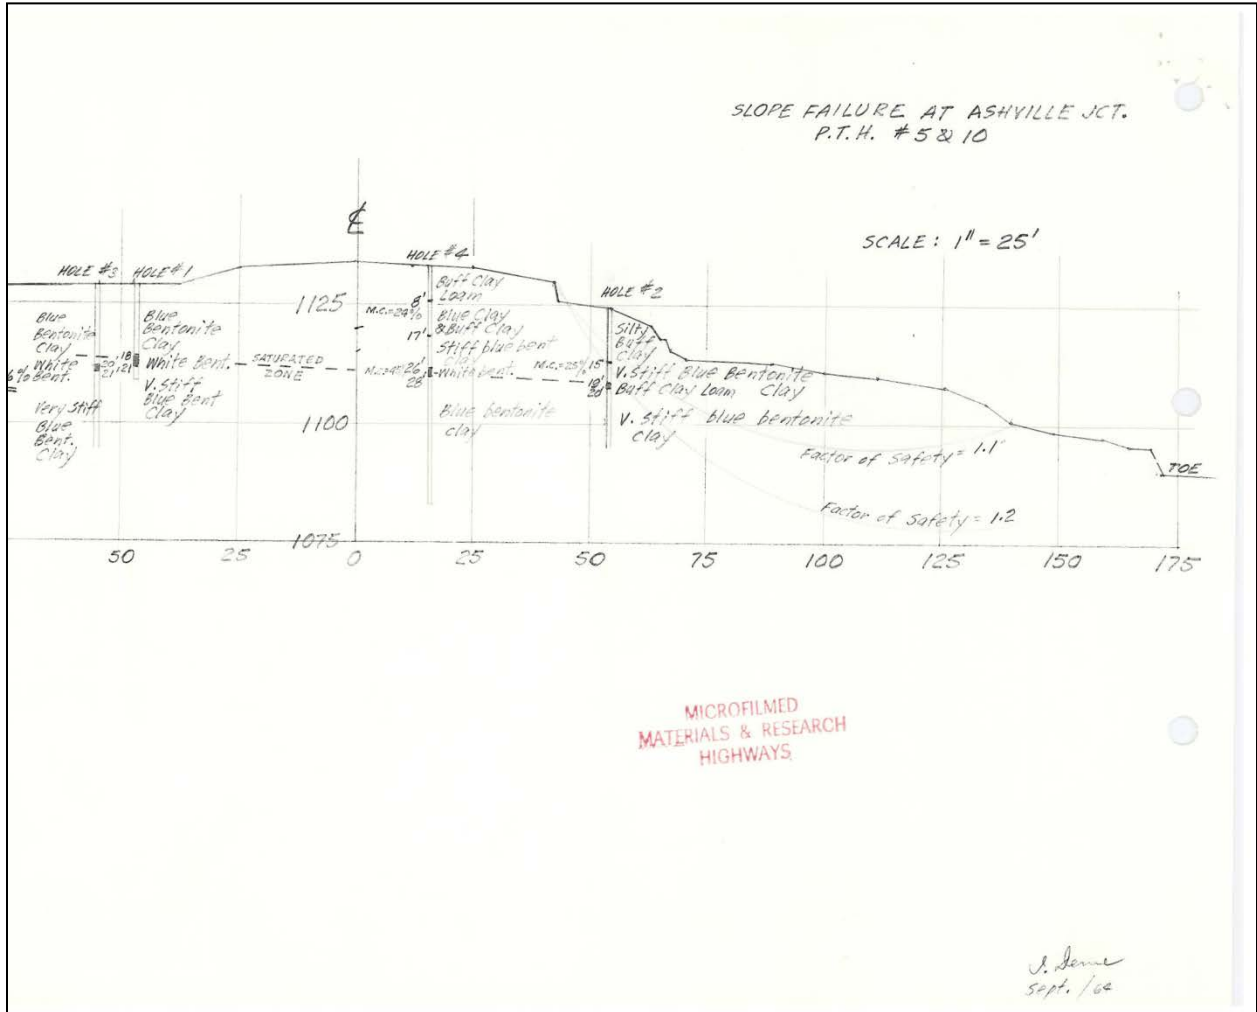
1964 Sketch of Cross Section at Failure Area
